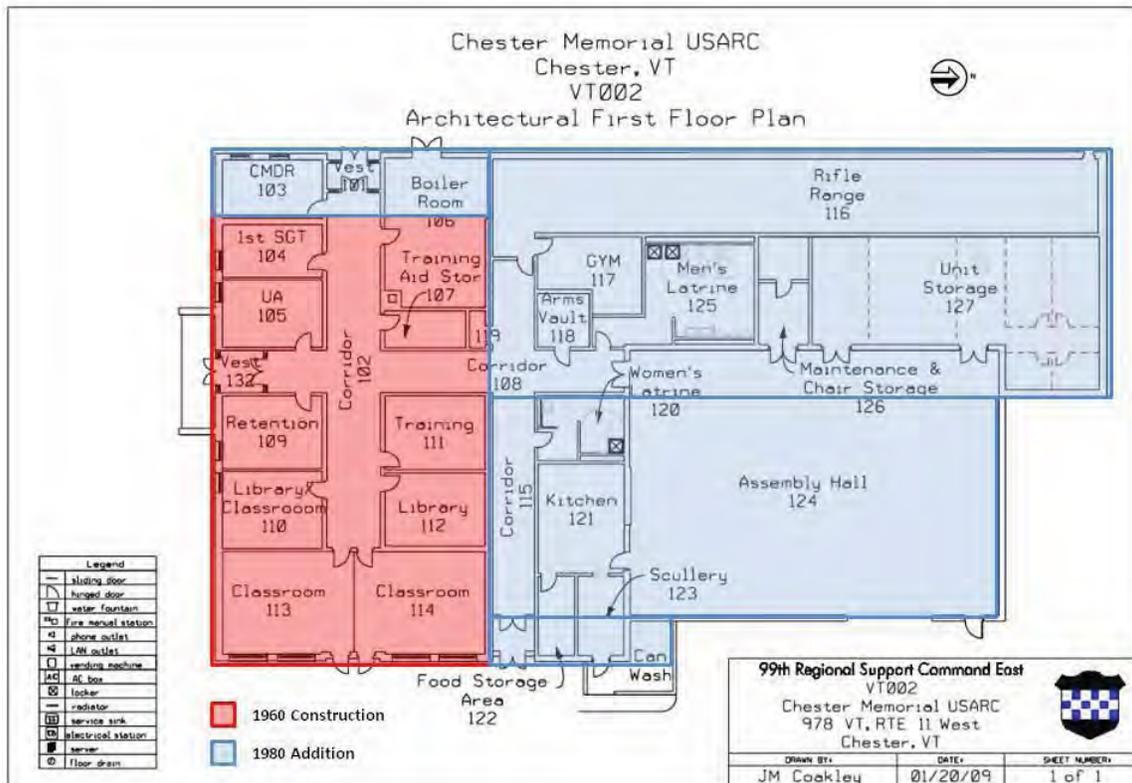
Chester Memorial USARC, current architectural floor plan of main building (altered from 99th RSC) [not to scale].
